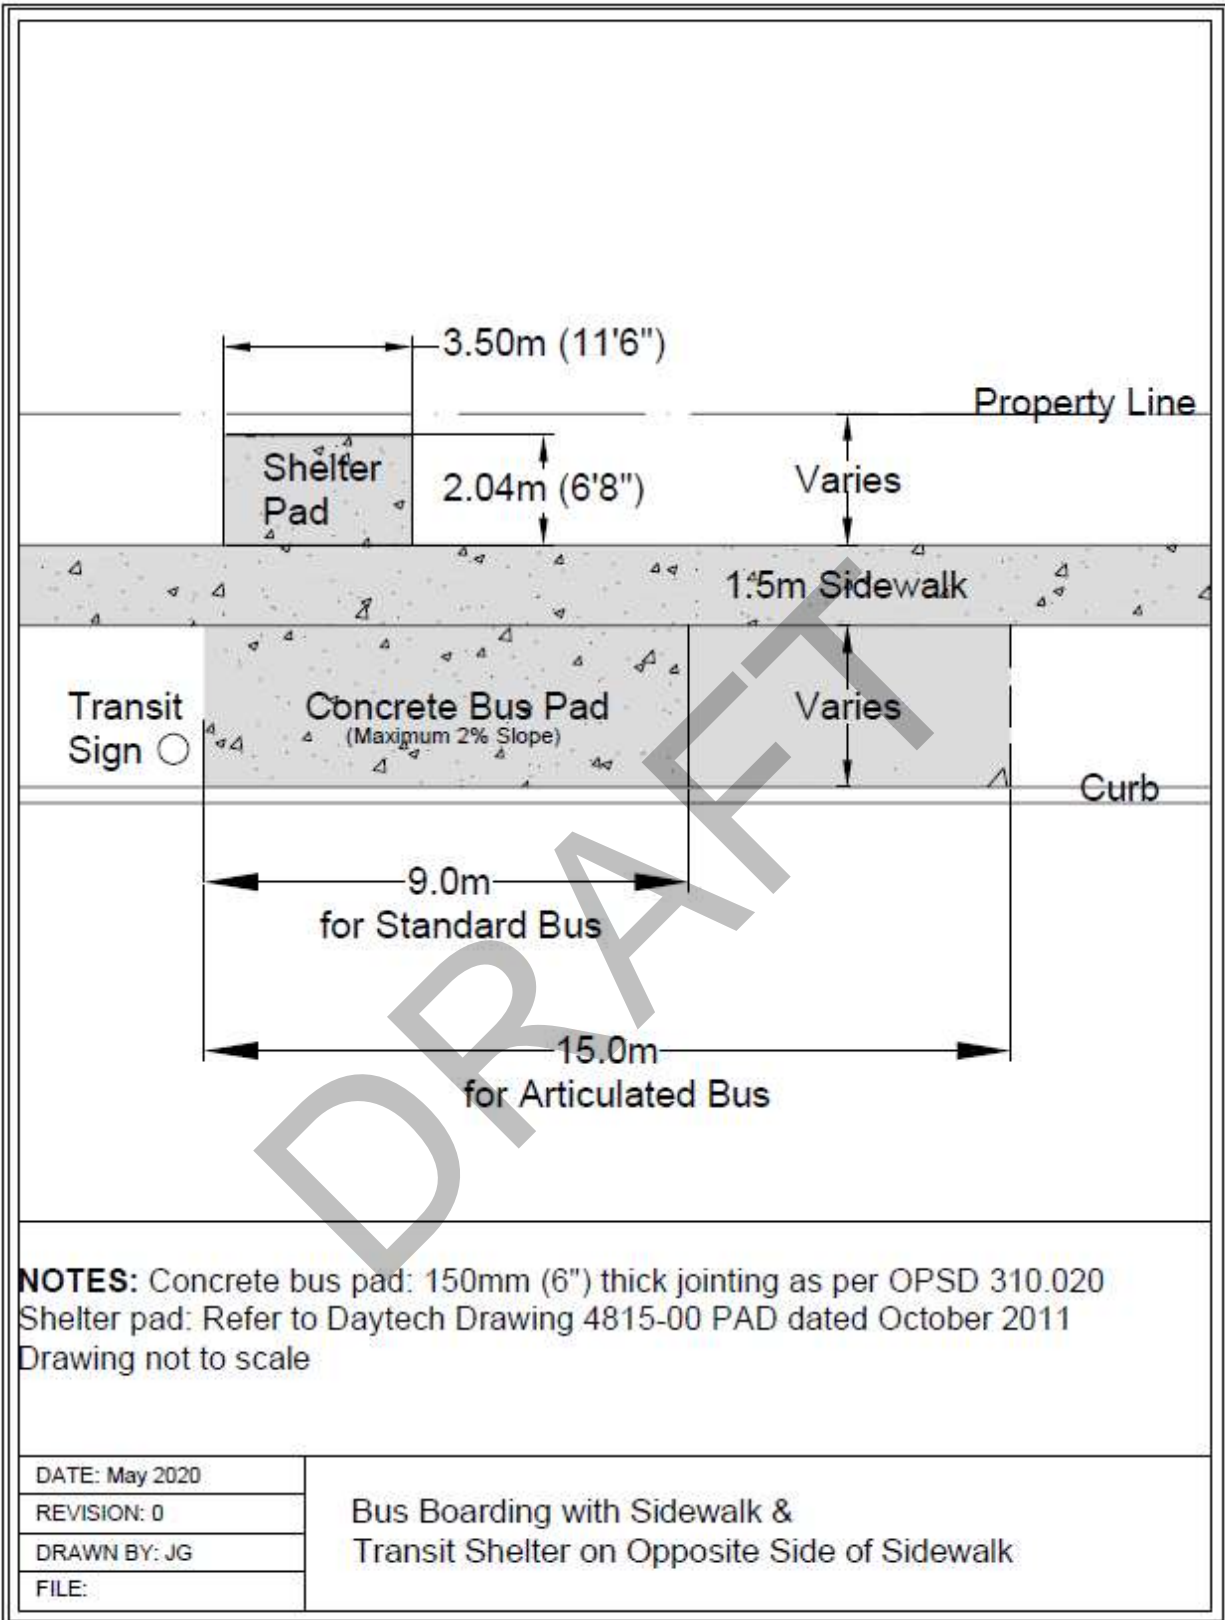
Diagram of bus boarding with sidewalk and transit shelter on opposite side of sidewalk.
